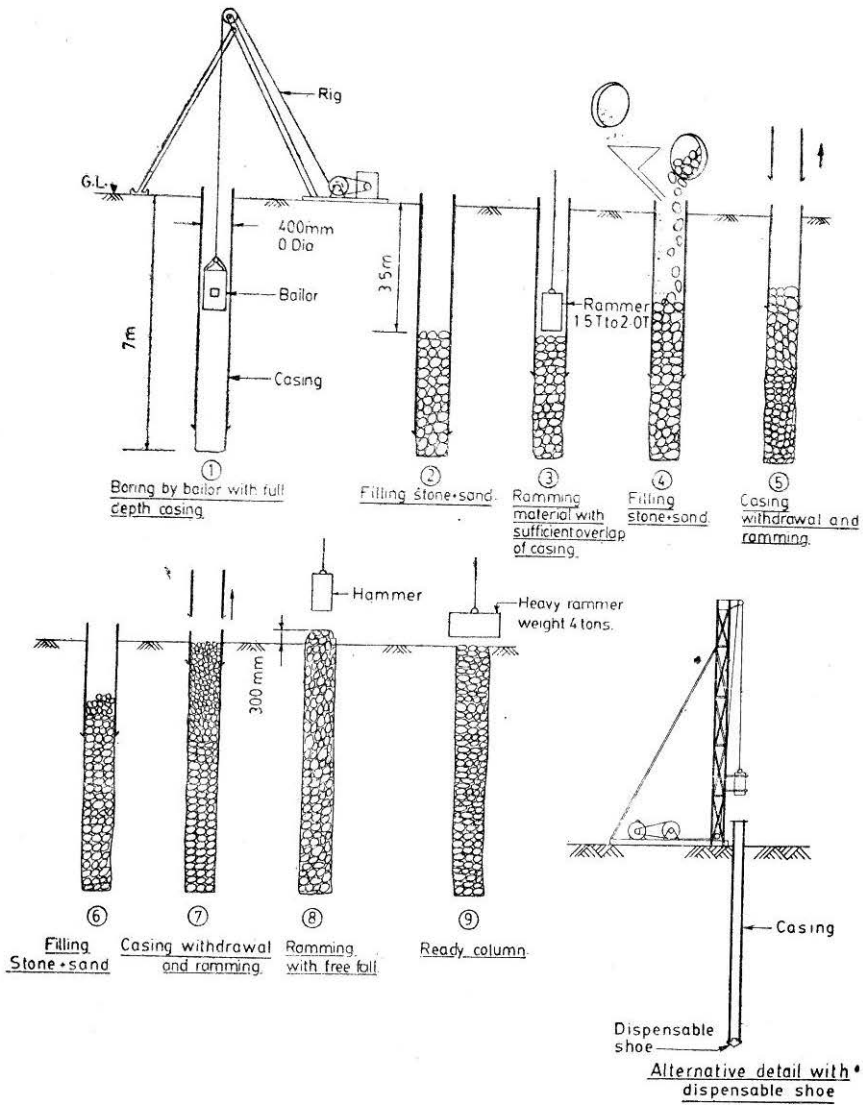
Installation methods rammed stone columns through cased bore holes
